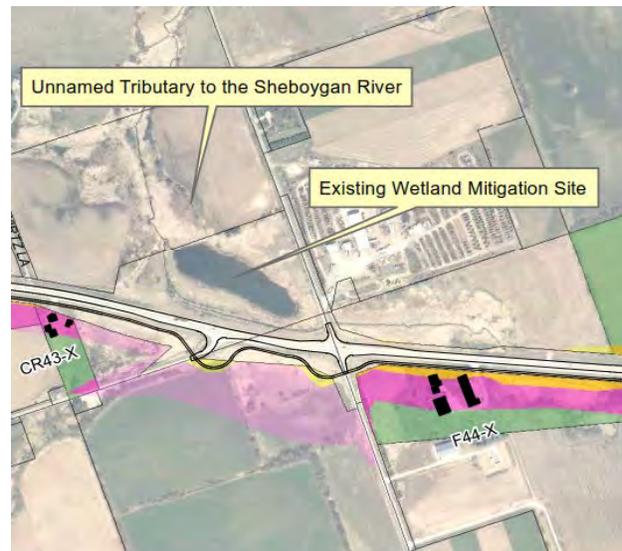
B-8.5 Pit Road Site—Passing Lane Alternative
